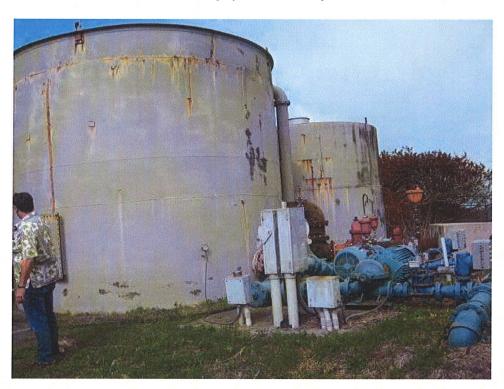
Hamakuapoko Well No. 2 Storage Tanks (Makai North View)
